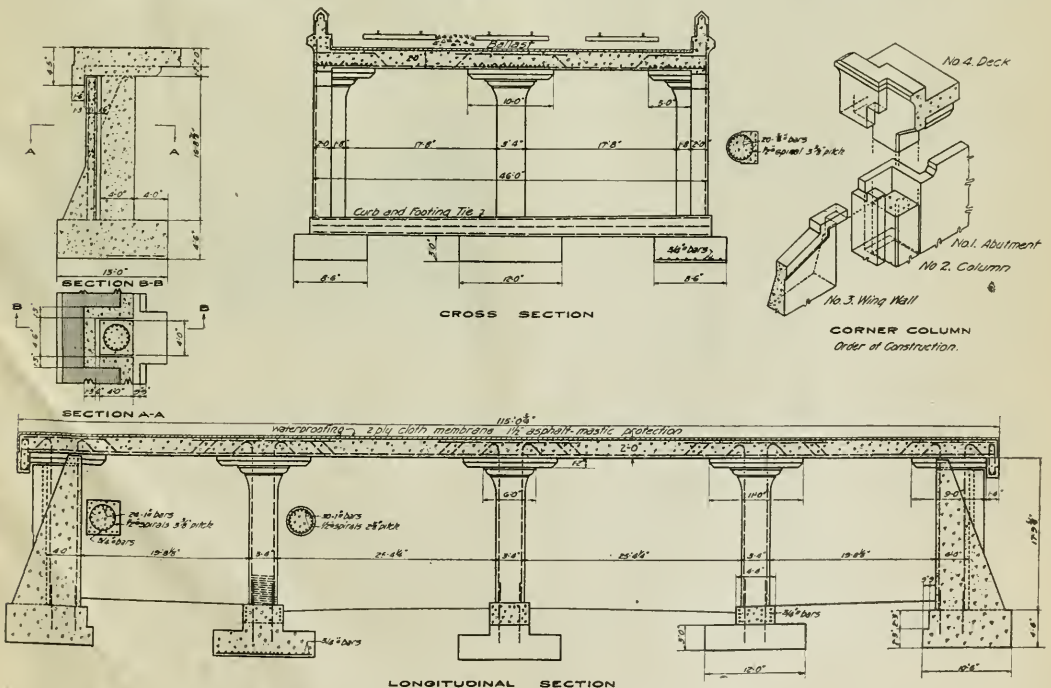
Details of Bridge at Central Avenue, Orange, N.J.
